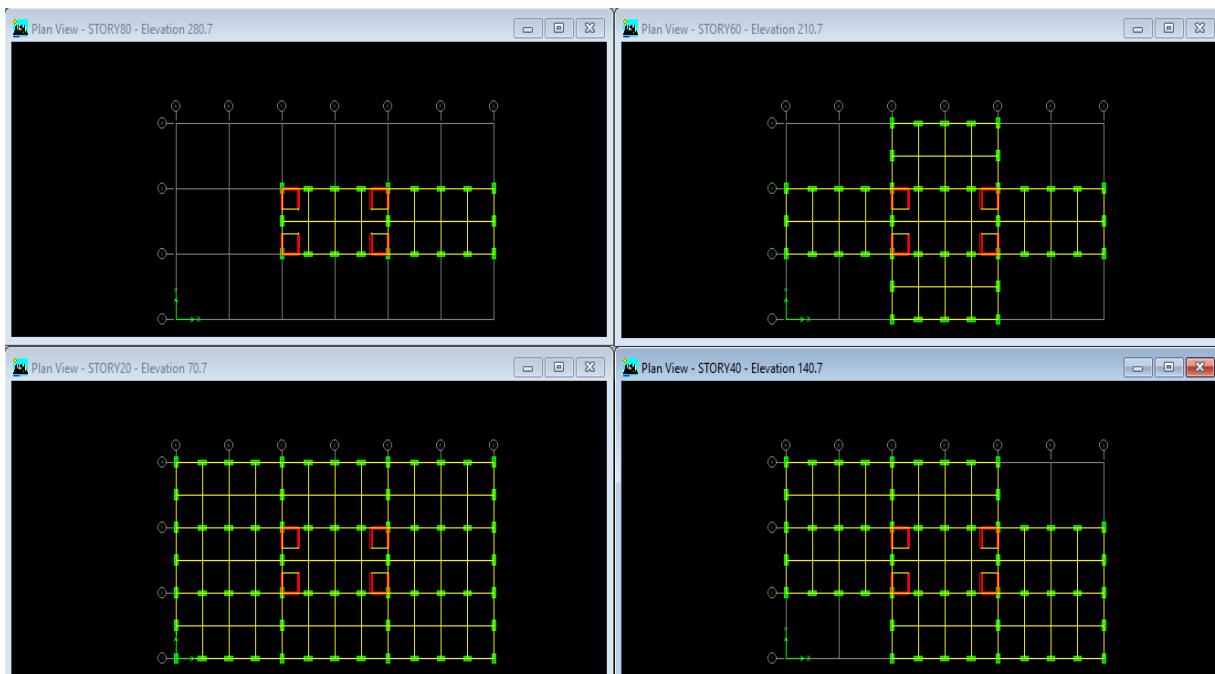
(a): Plan view of 80 storied Bundled Tube structure building
